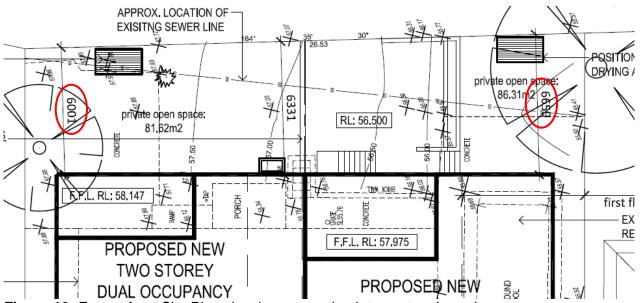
Extract from Site Plan showing rear setback to eastern boundary.
